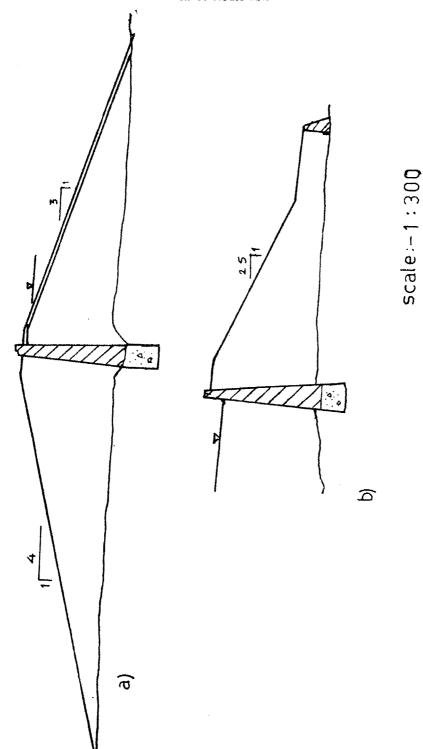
Earth dams with masonry walls, Jayapore state (a) Kair dam, (b) Foysagar dam (Ref. 12).
